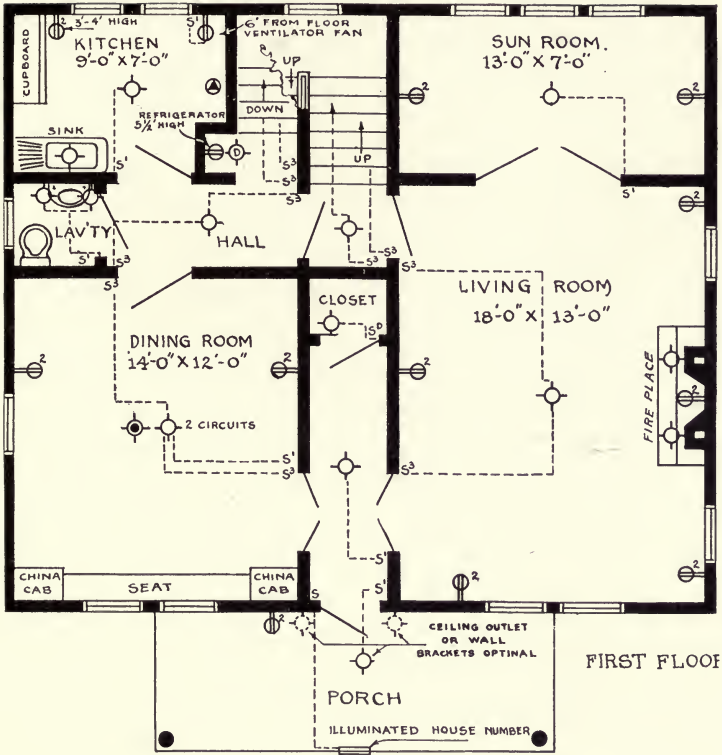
Wiring layout suggested for the procurement of electrical comfort and convenience. Typical first-floor plan.
